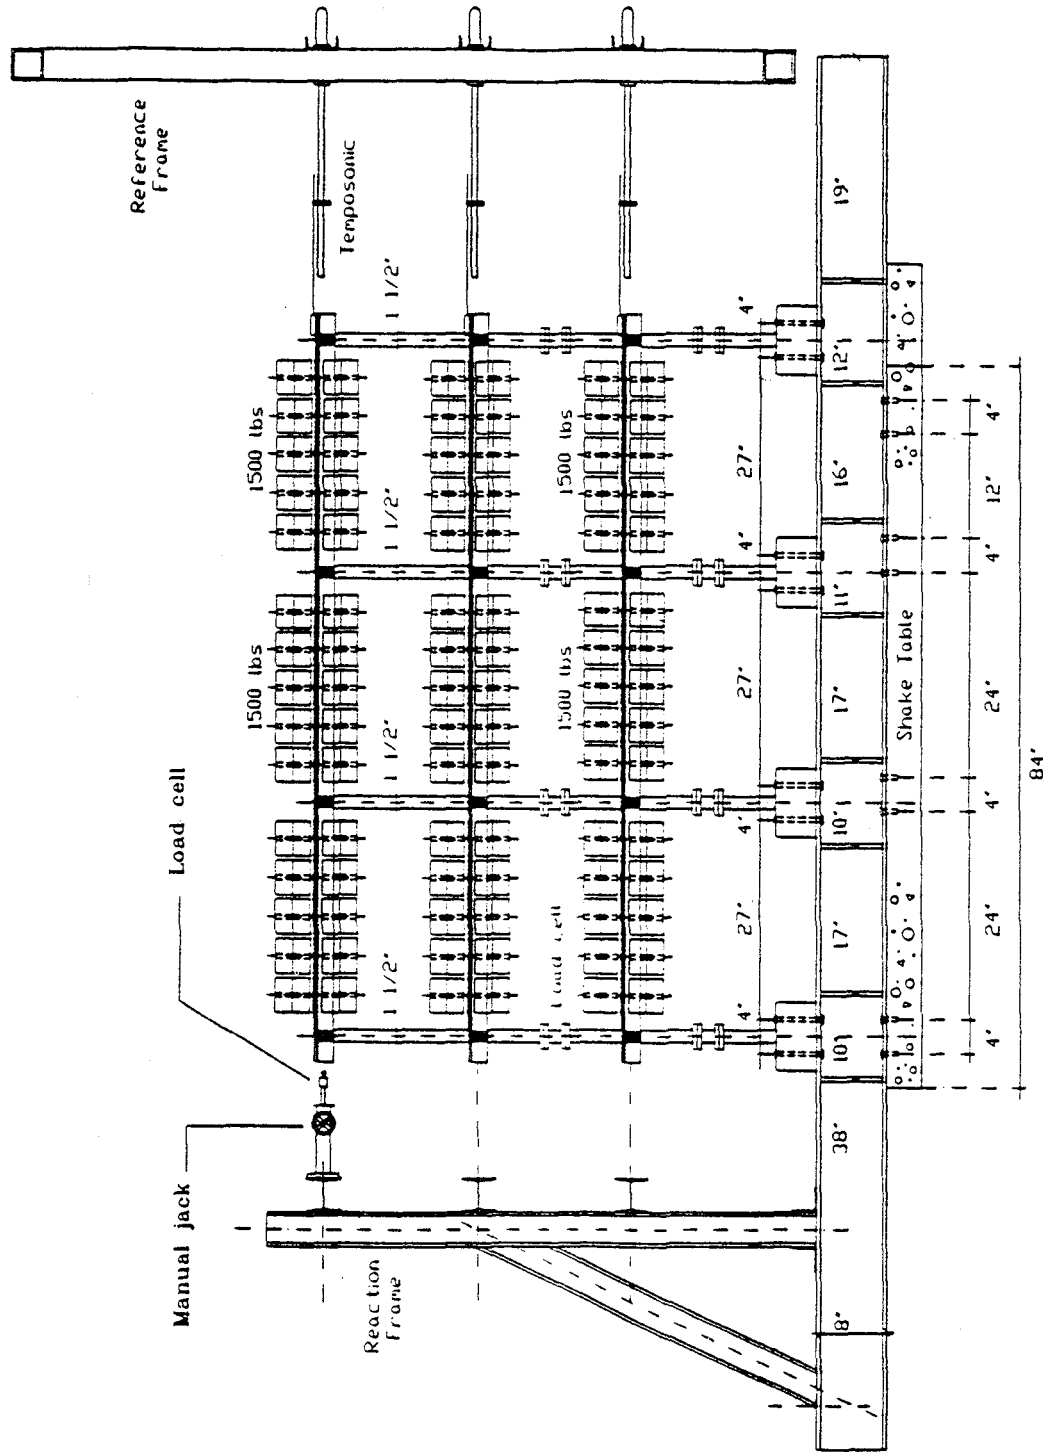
3-Story Building Static Test Load Set-Up.
